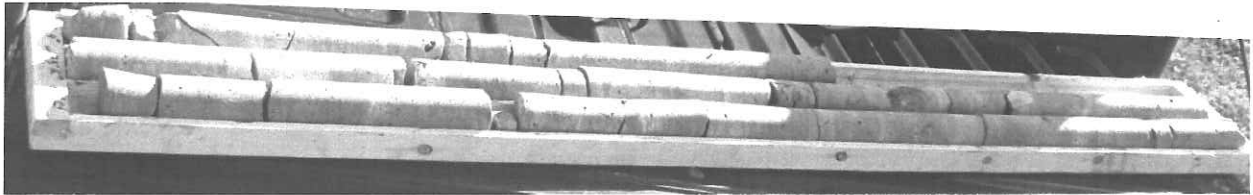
BH10-5 – Depth 22.05 m to 26.7 m
